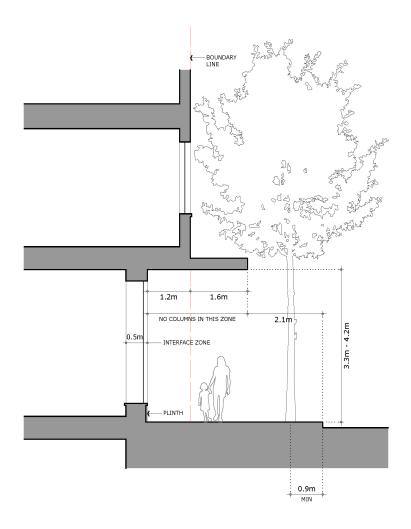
Street Section Aird St, O'Connell St and Campbell St
